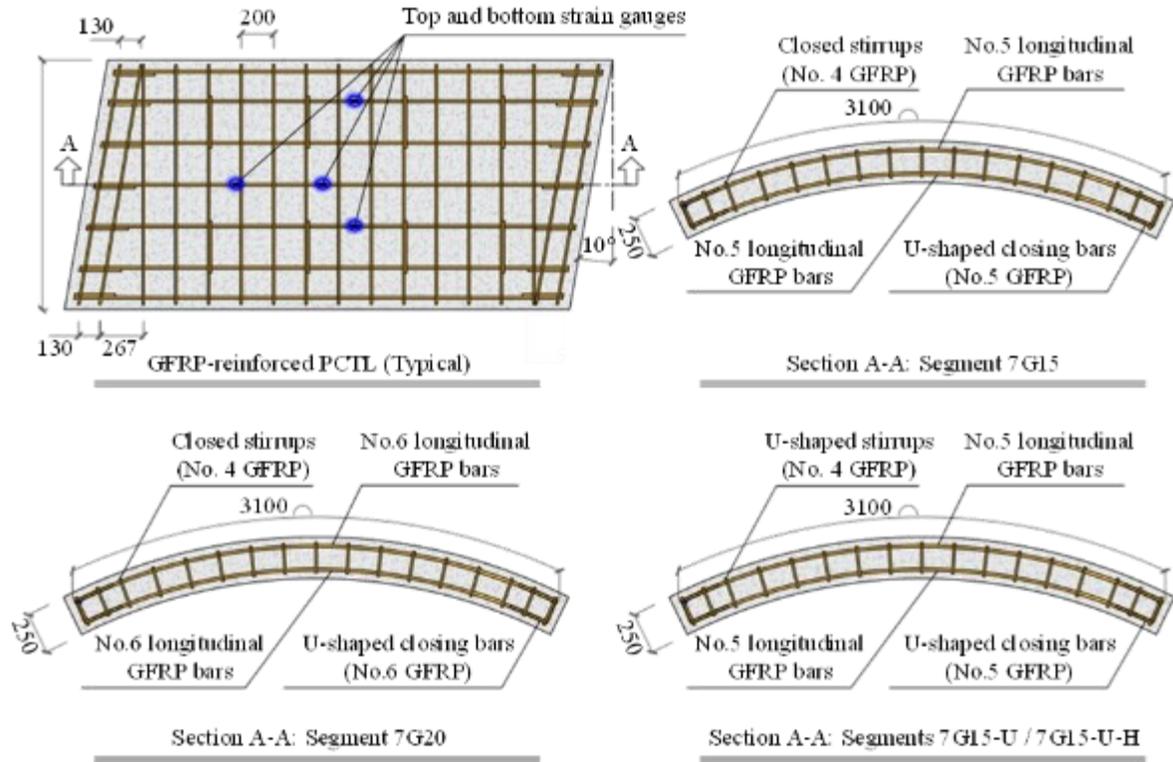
Reinforcement details for the test segments. (Note: all dimensions in mm; 1 mm = 0.0394 in.)
